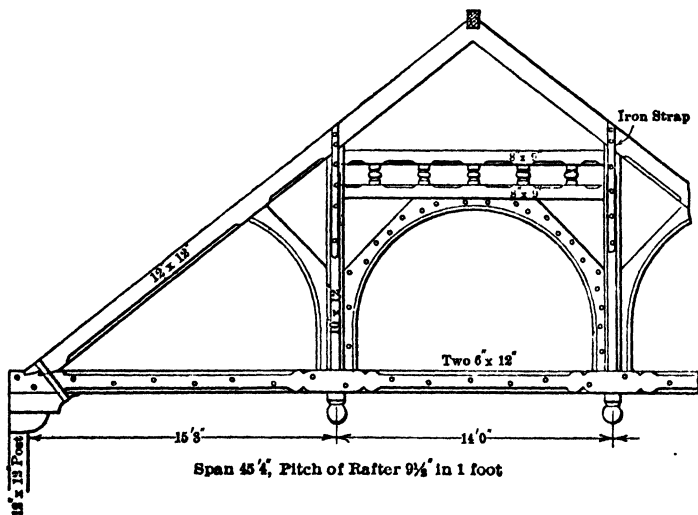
Queen-post Truss. Massachusetts Charitable Mechanics' Association Building, Boston, Mass.
